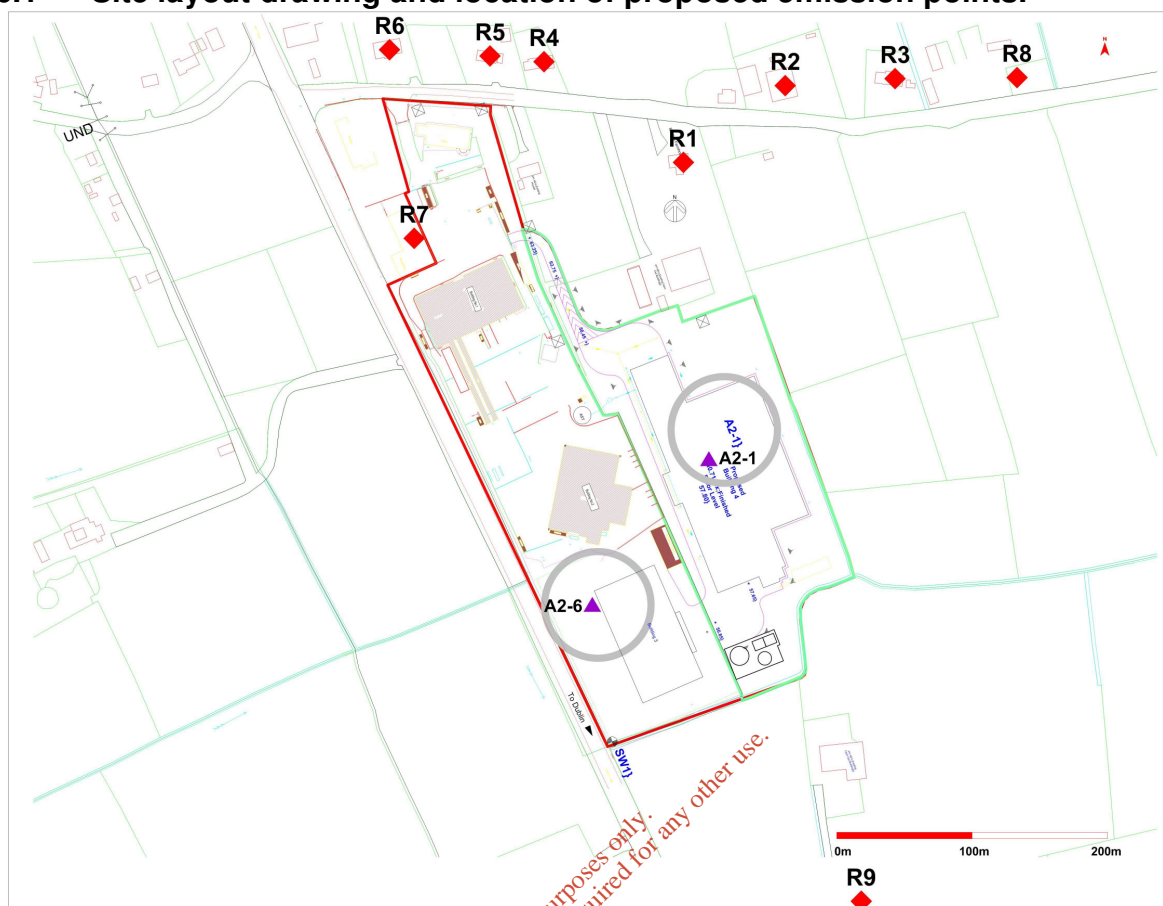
Plan view facility layout drawings for proposed emission points (A2-1 and A2-6).
